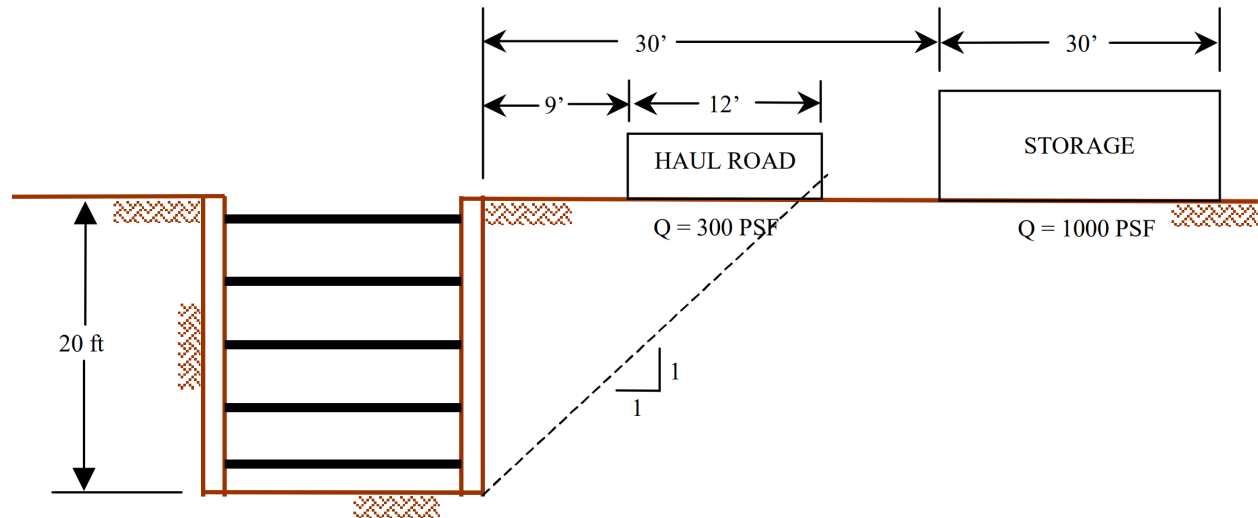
Excavation Near a Haul Road and Storage Building with Various Surcharge Loads
